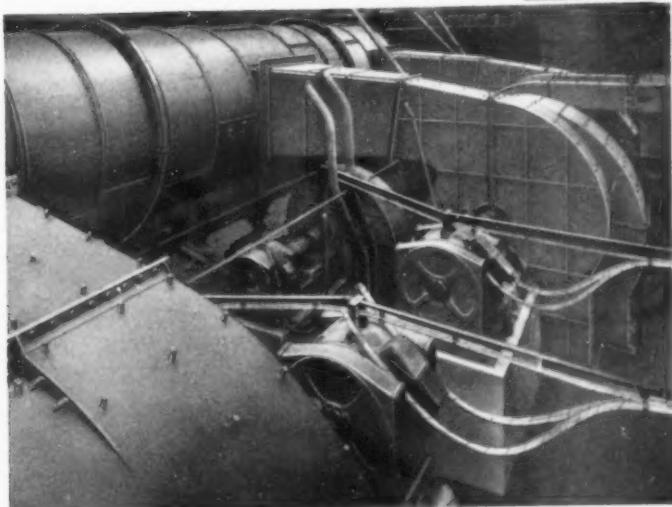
(left).—Example of ducting and sectioned pipe-work installed. Pipe-work is built up from rolled sections and the ducting constructed from suitably shaped metal plate, the edges of which are rolled or formed on a press brake to the correct contour, and welded, or bolted according to the degree of sealing required
